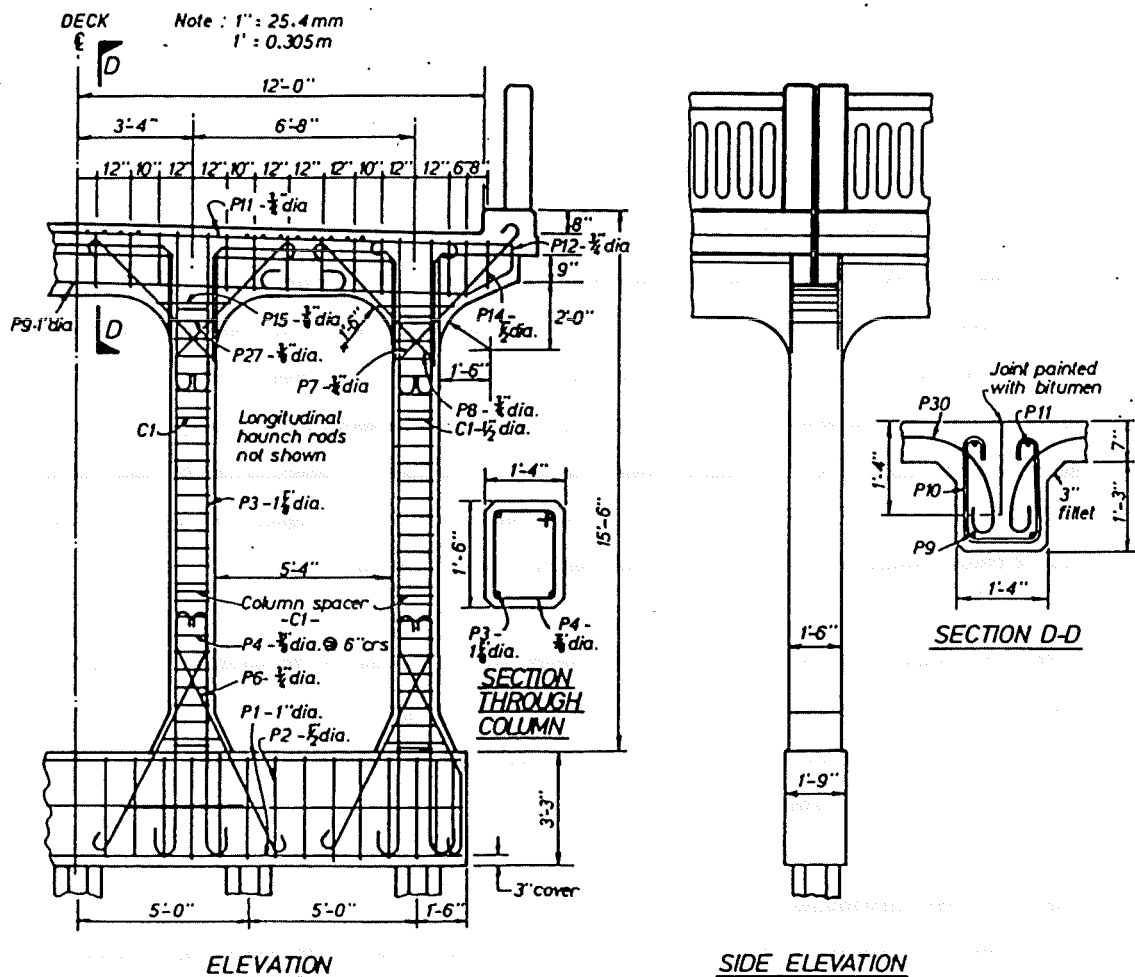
Reinforcement details of bridge column investigated [Park et al 1993].
